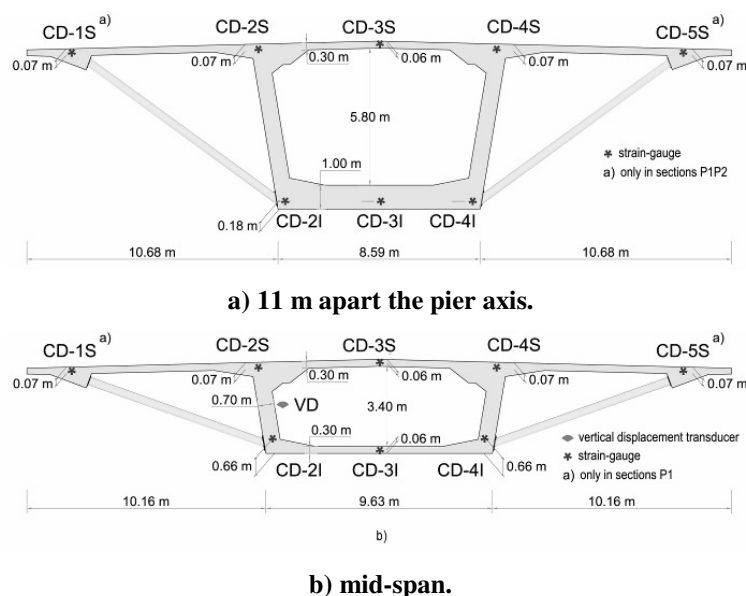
Layout of the vibrating wire strain gauges positioning at cross section.
